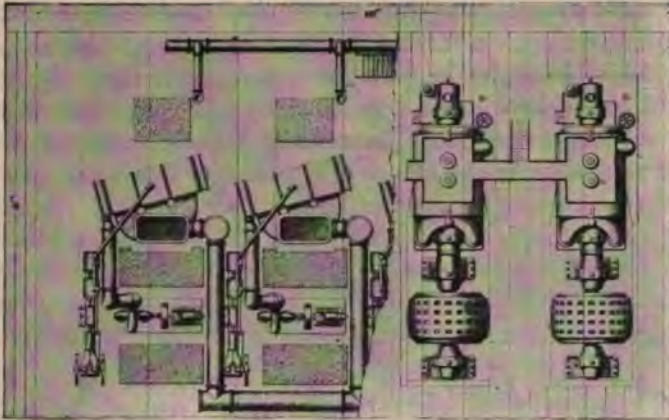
POWER-HOUSE CONTAINING FOUR 5500-KW WESTINGHOUSE-PARSONS STEAM TURBINES AND CONDENSERS. PLAN
